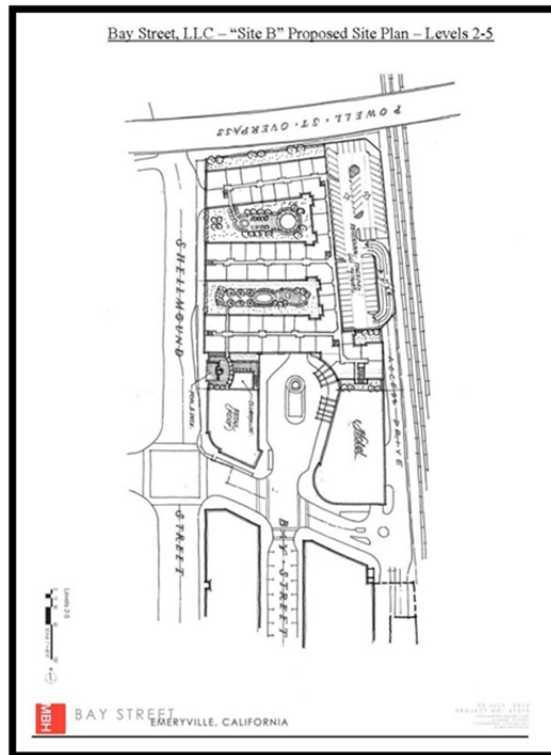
Madison Marquette Site B Junior Anchor Plan Residential Above Ground Floor
